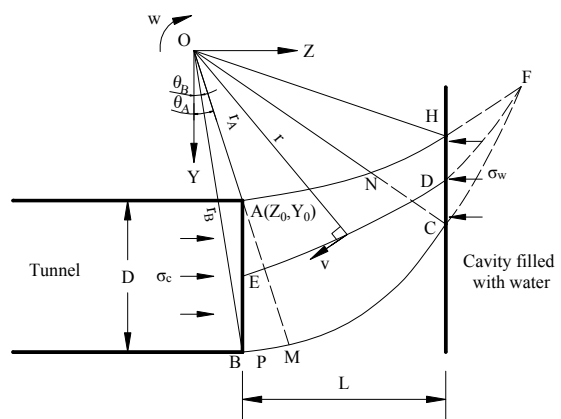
Failure mechanism with a water-filled cavity positioned ahead of tunnel face
